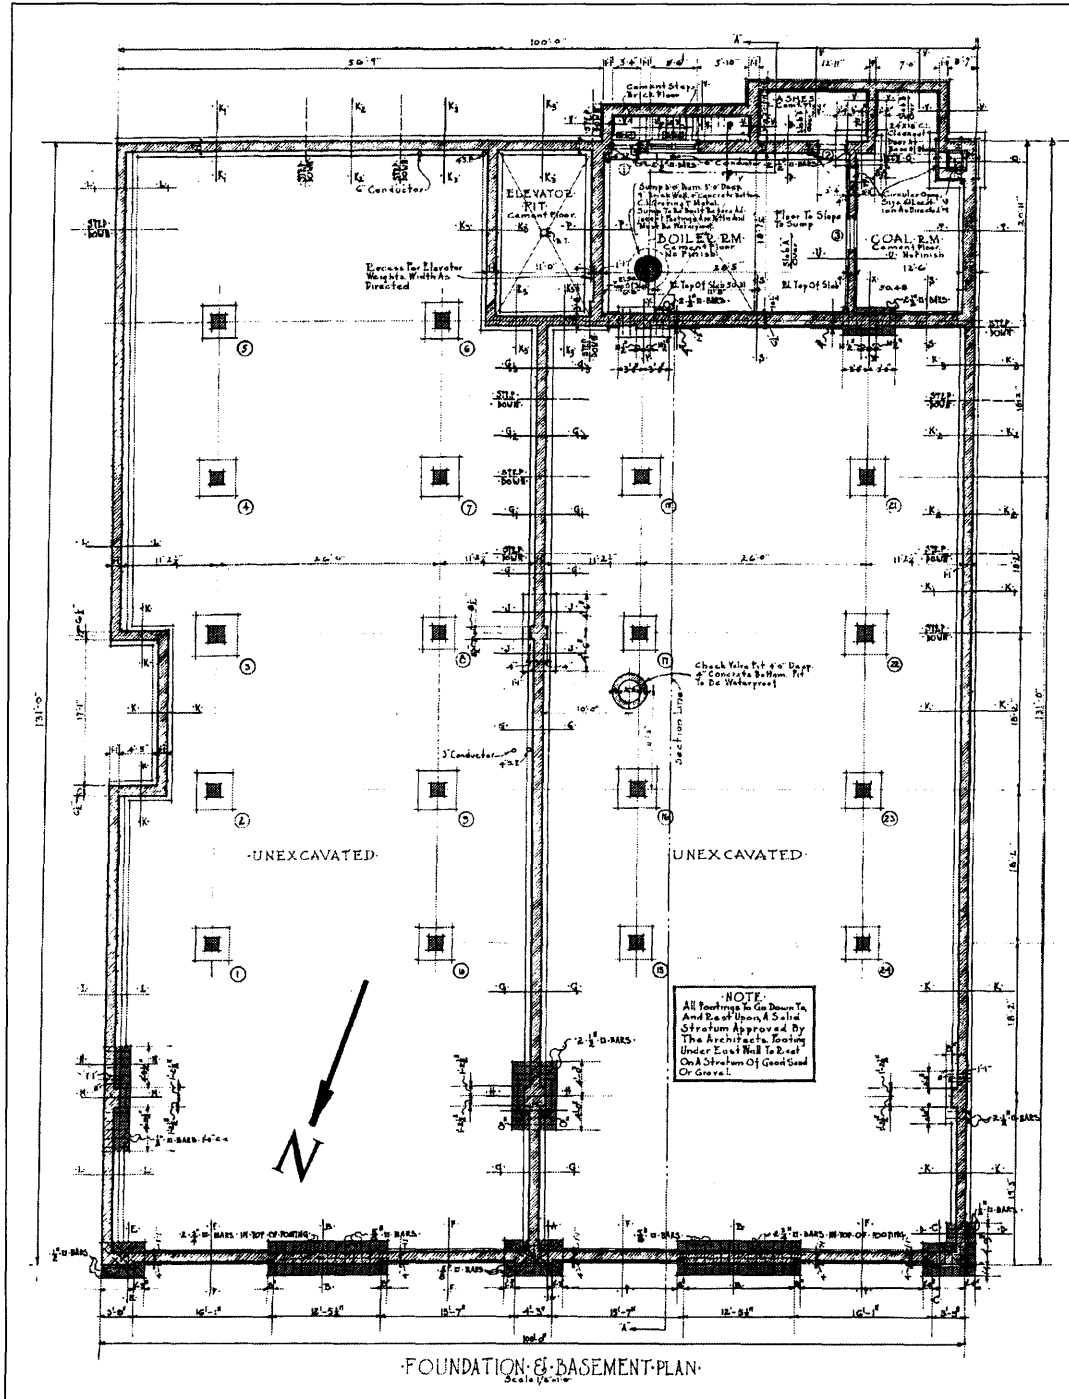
Historic foundation floor plan (Proudfoot, Bird & Rawson, architects, 1916)
